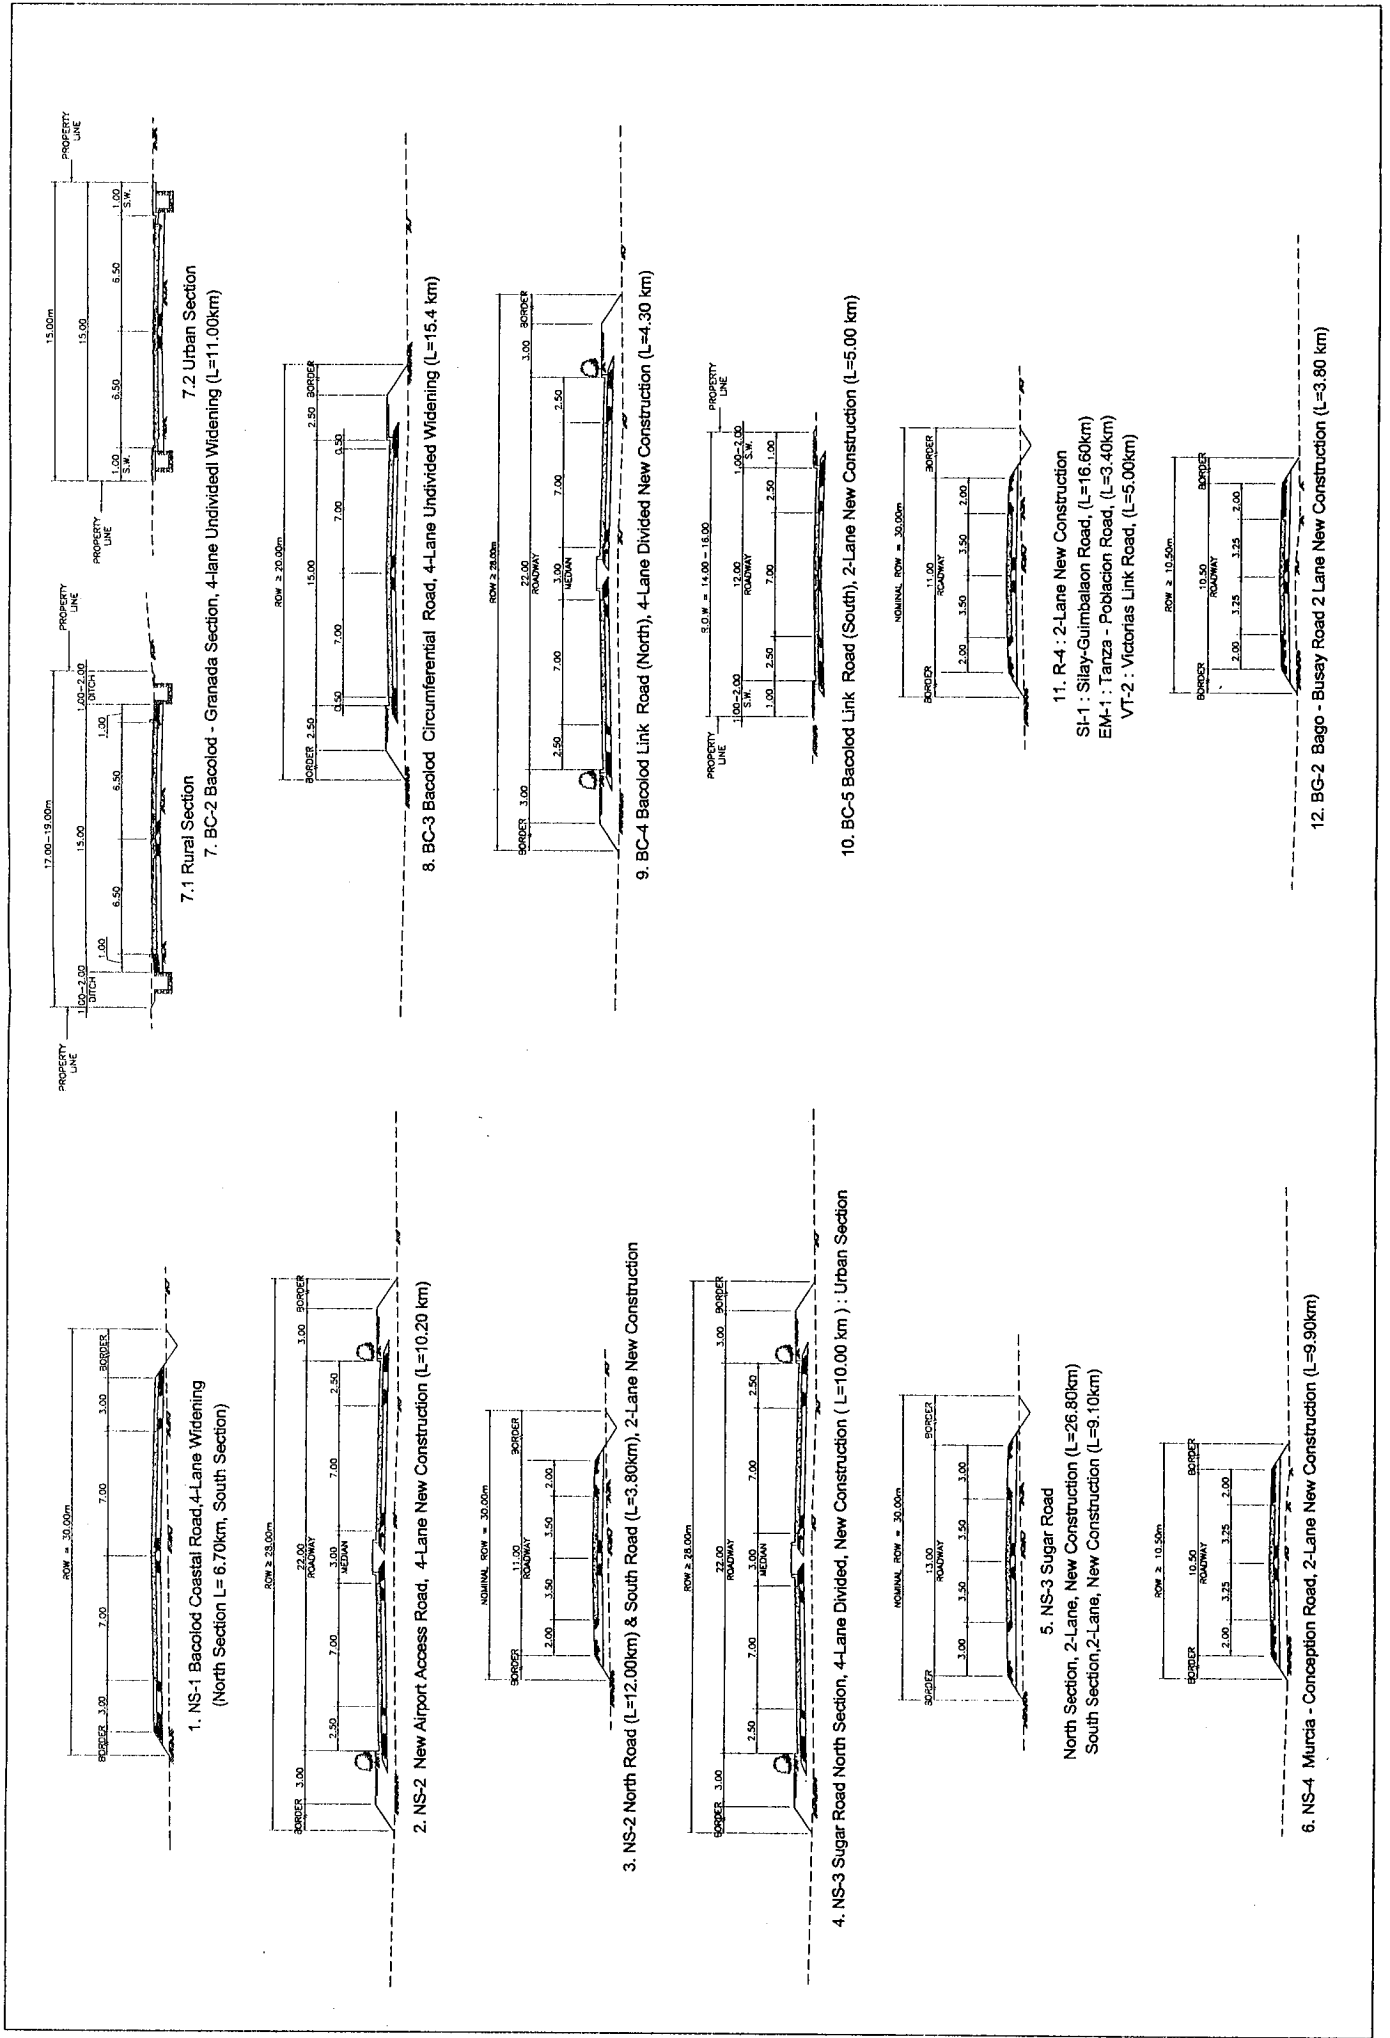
Metro Bacolod : Proposed Cross-Section for New Road and Widening
